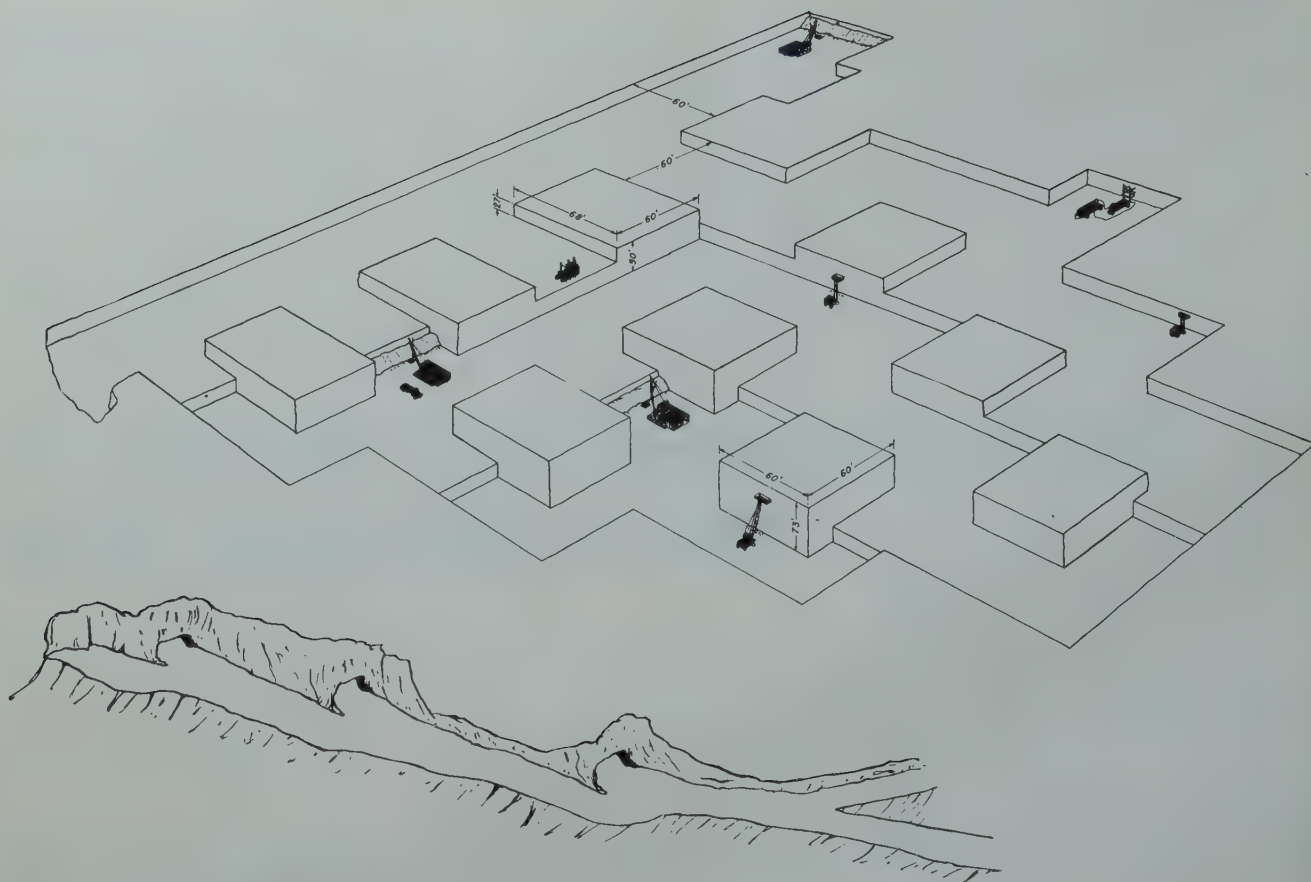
Underground quarry mine layout, oil-shale demonstration plant, Rifle, Colo.
